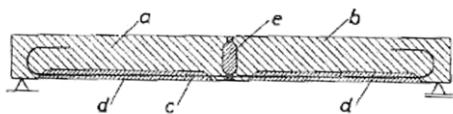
Beam with joint filled with expansive concrete (Möll, 1954)
